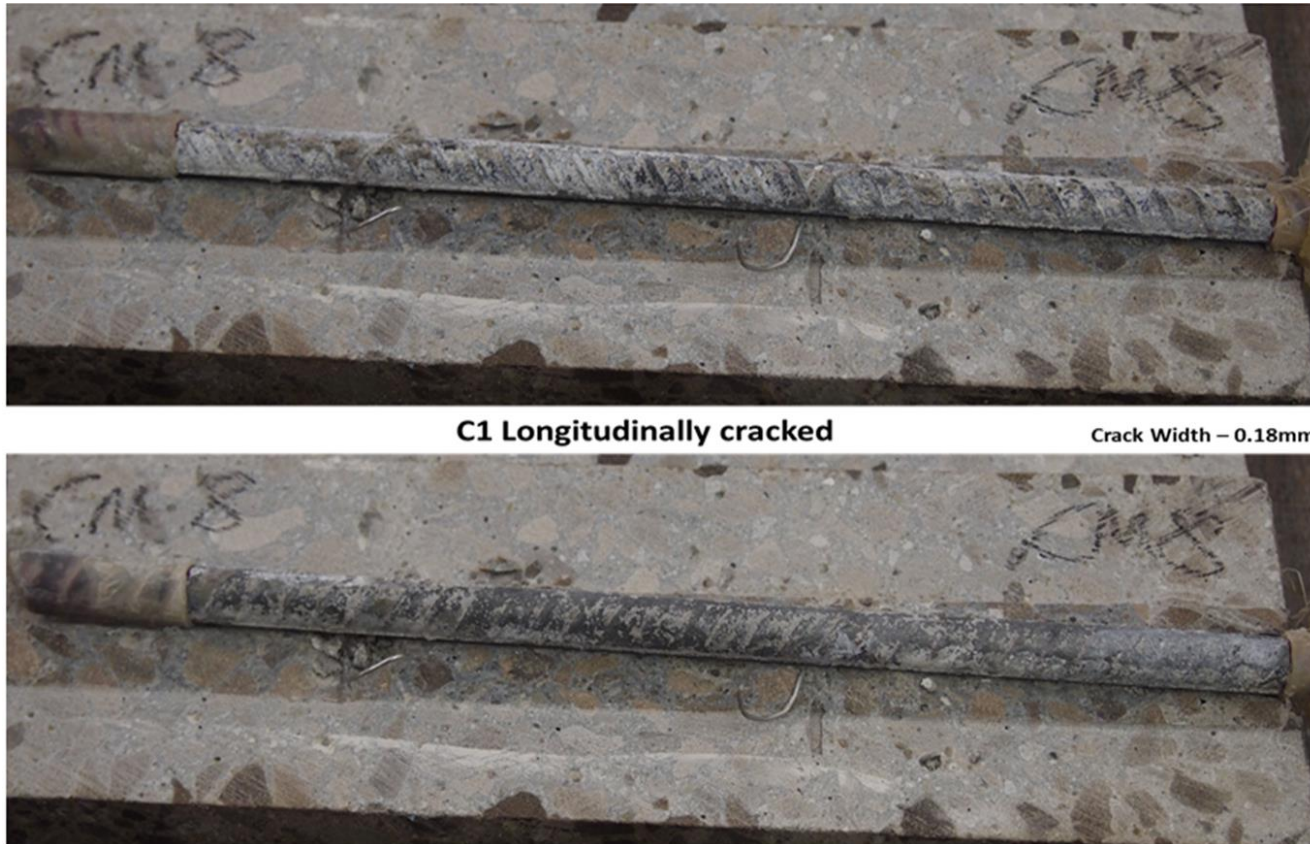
Concrete specimen of autopsied longitudinally cracked C1 specimen
